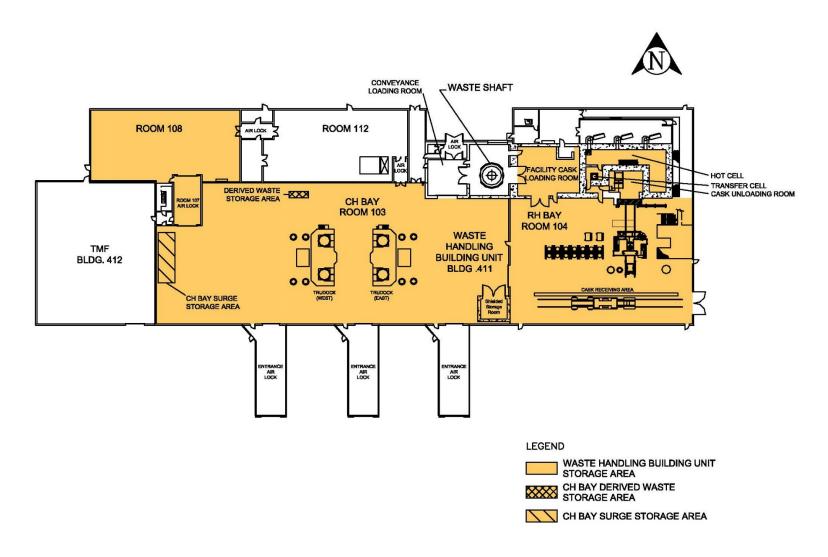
Waste Handling Building Unit- TRU Mixed Waste Container Storage and Surge Areas
